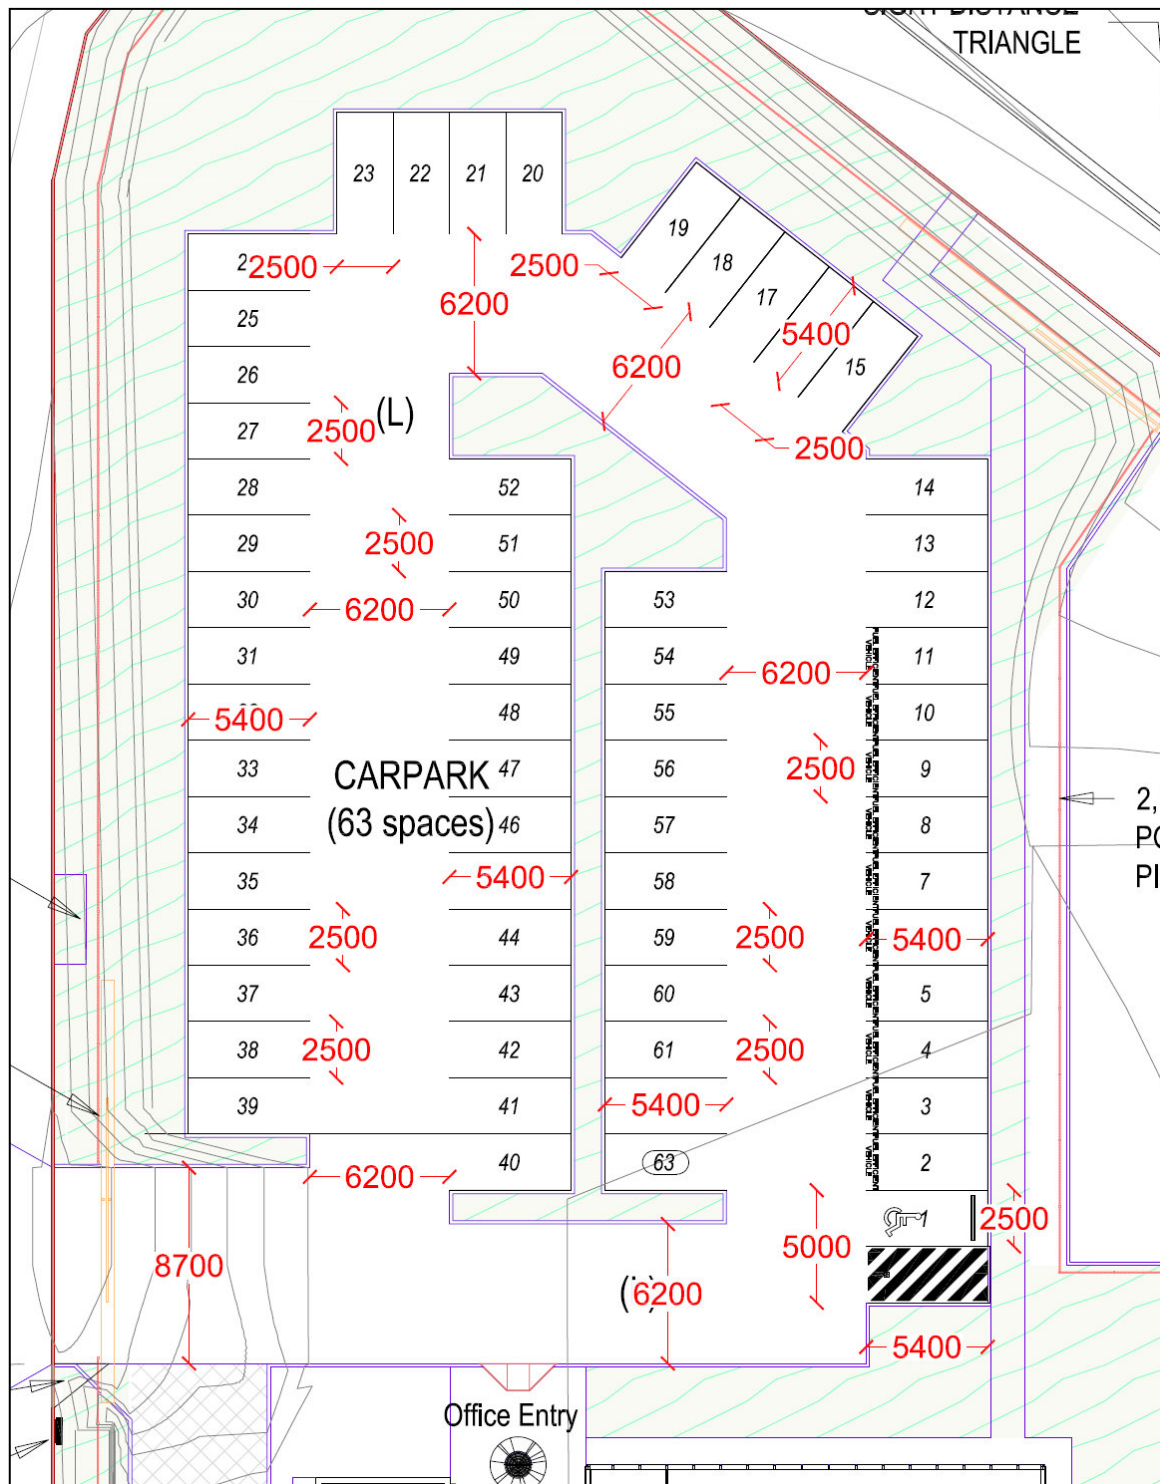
DIMENSIONED CAR PARKING LAYOUT
